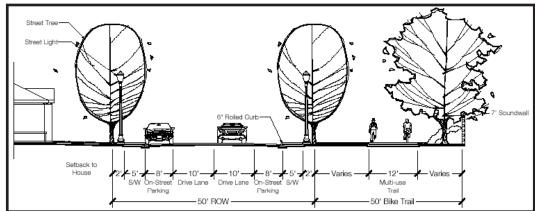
Neighborhood Street at Tidewater Trail- Union Ranch East, Section K
